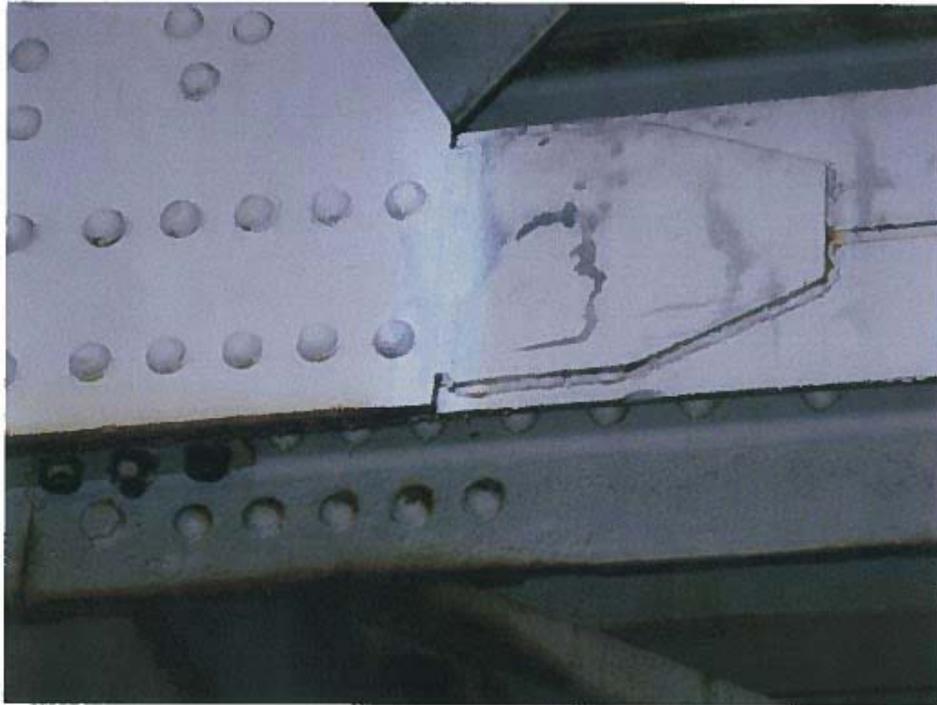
Magnetic particle testing of welded reinforcement at bottom flange of floor beam at panel point 2W
